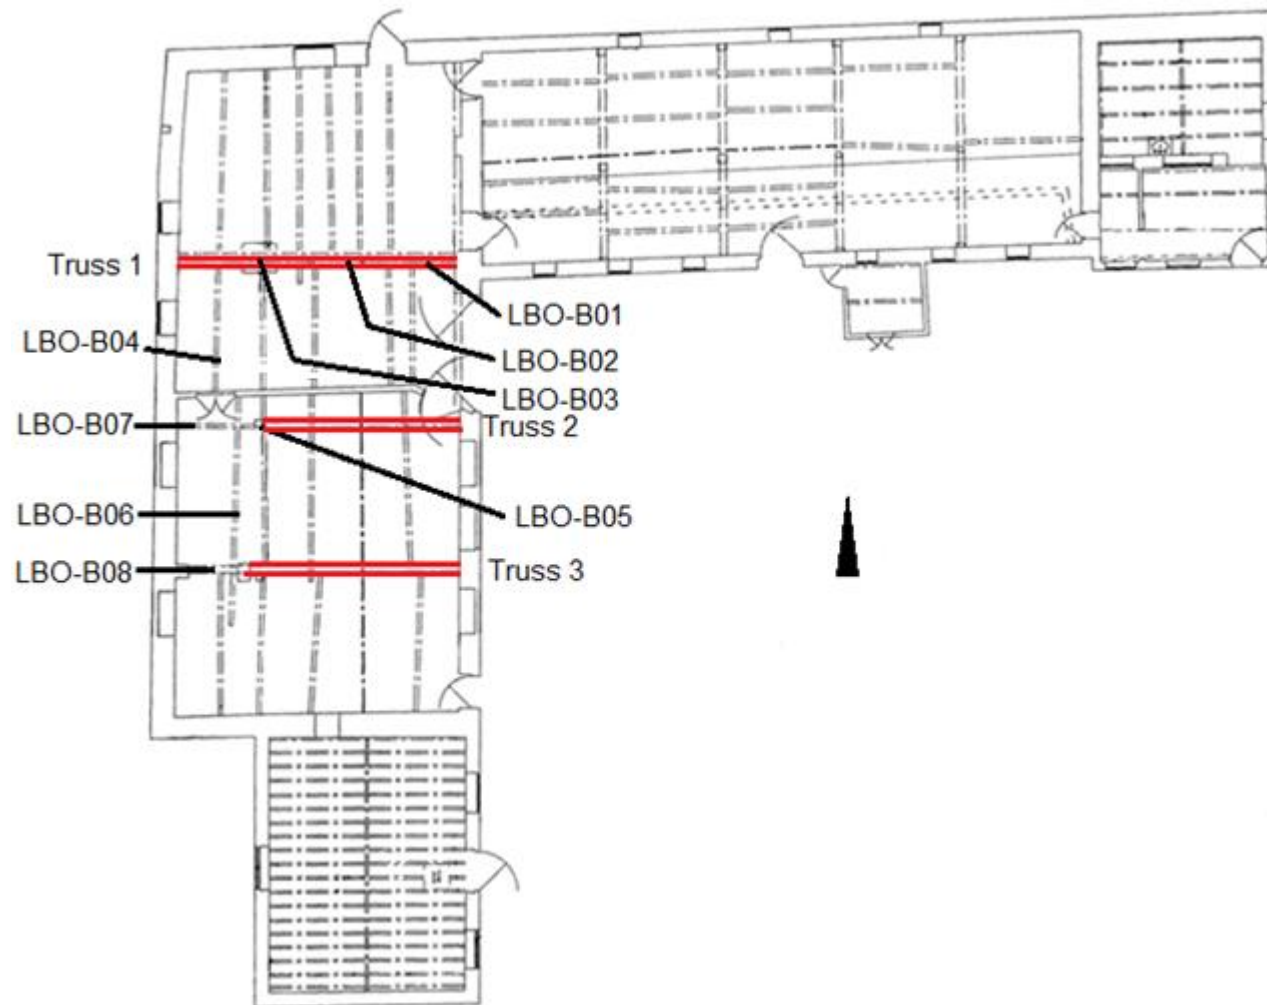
The barn, ground-floor plan, showing truss positions and the location of samples LBO-B01-08 (Peter Harrison Architects)
